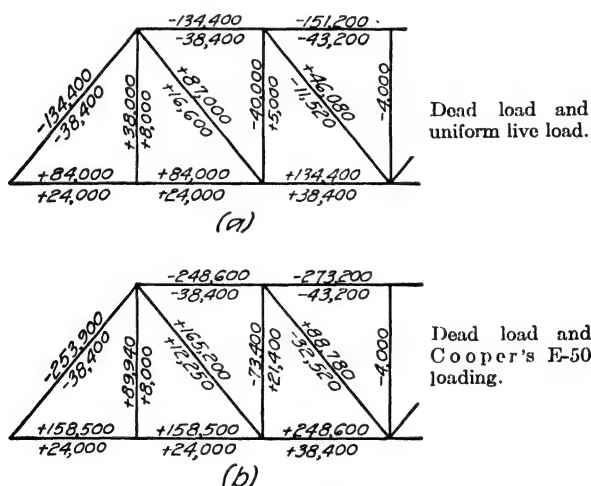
Maximum and minimum stresses, through Pratt truss without counters.
